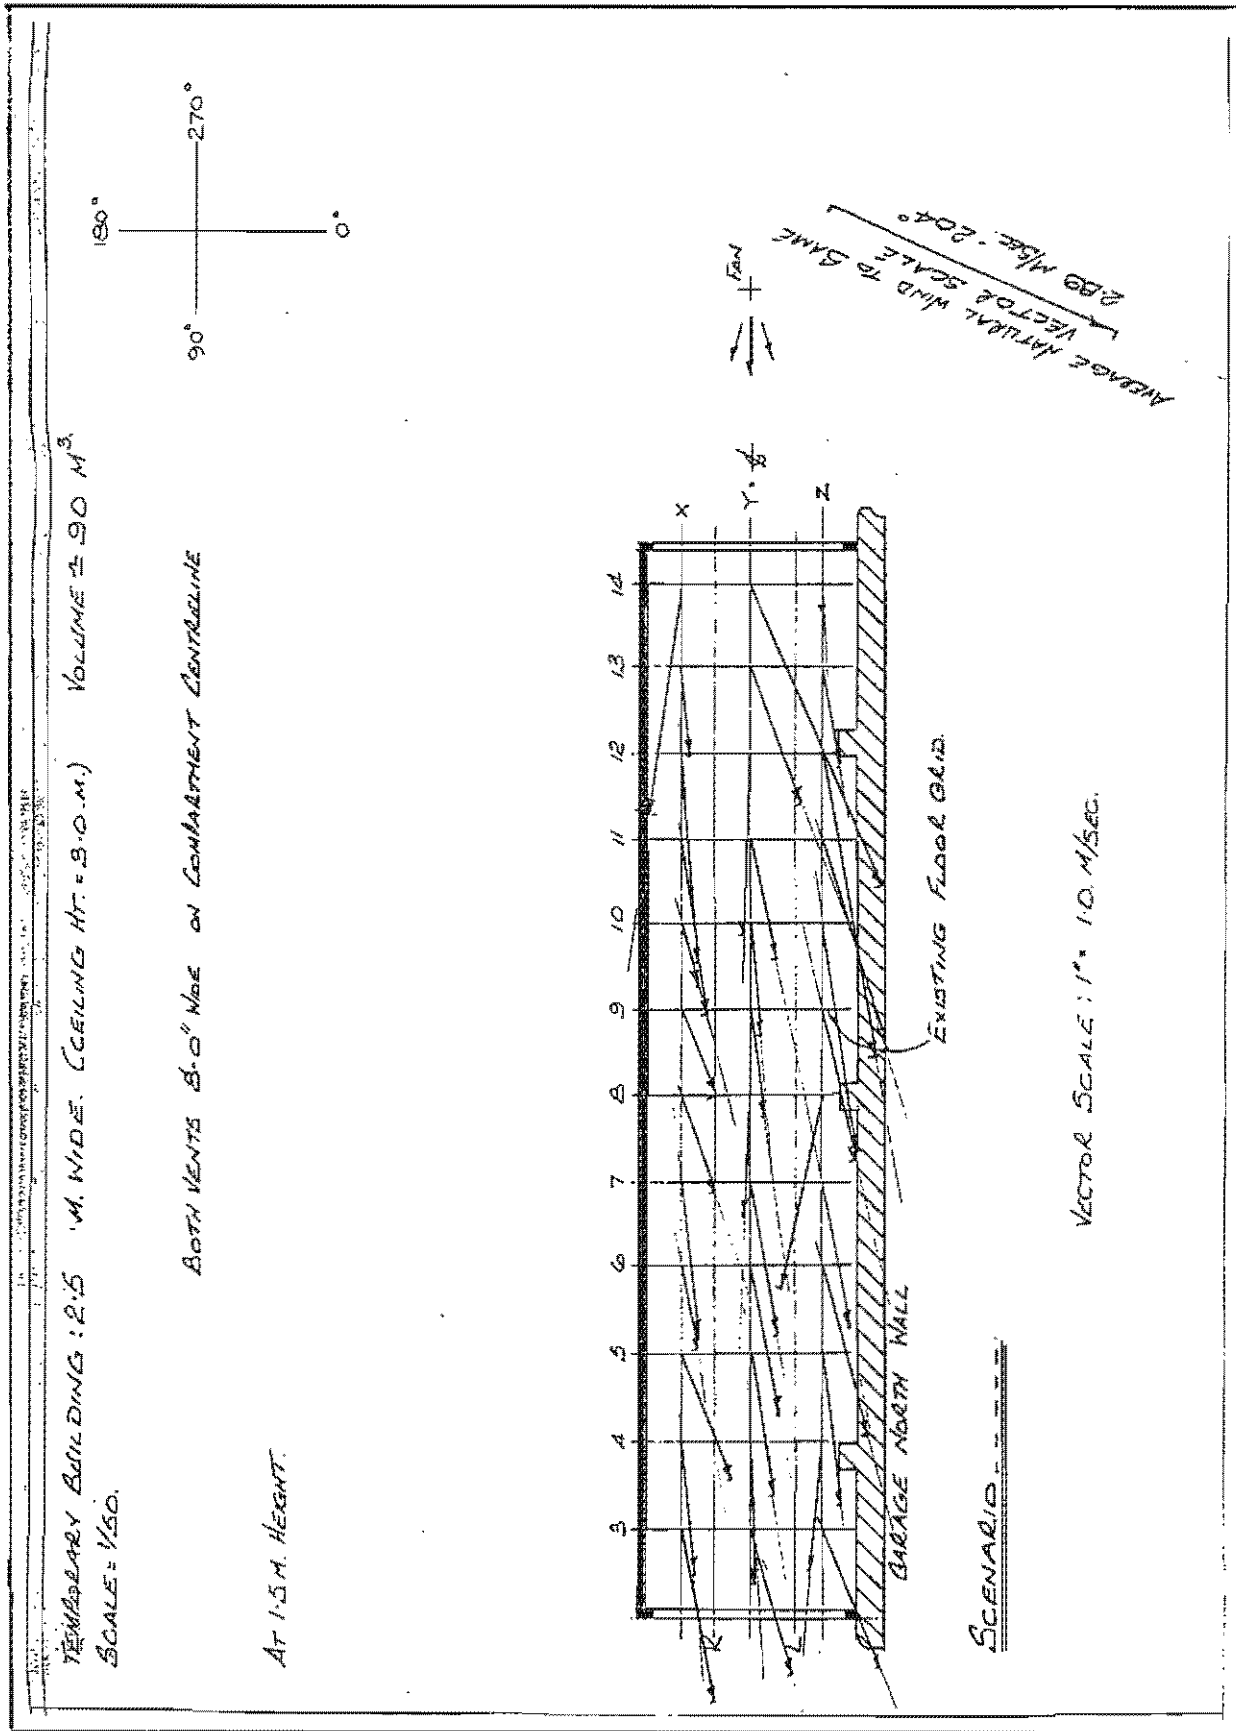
Airflow survey in 2.5 metres wide compartment: 8' 0" inlet - 8' 0" outlet.
